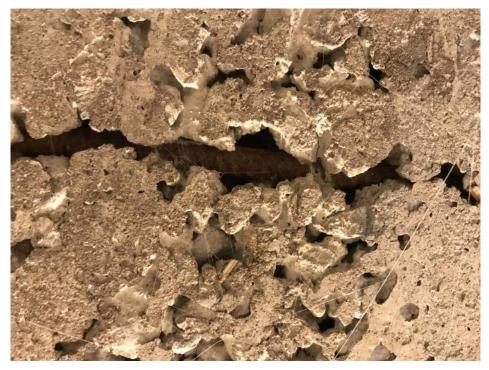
| Spalled and Delaminated Concrete located towards the Top of the North Foundation Wall in the Brine Trench
